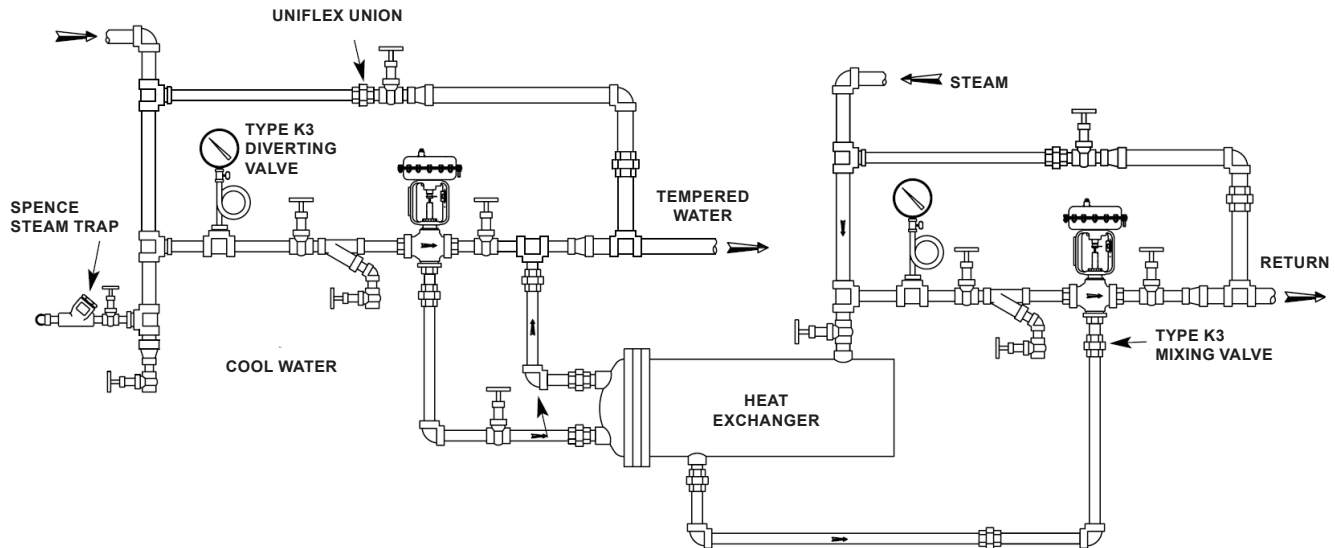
Type K3 Control Valve Recommended Installation for Steam Application
